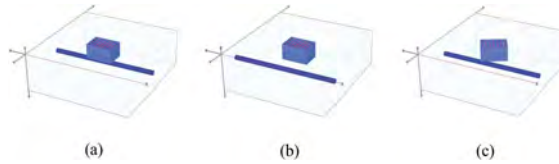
Scenarios of relative position of tunnel and foundation pit: (a) tunnel is located directly below the foundation pit, (b) tunnel is located on the paralleled lateral side of the foundation pit, and (c) tunnel intersects the foundation pit diagonally.
